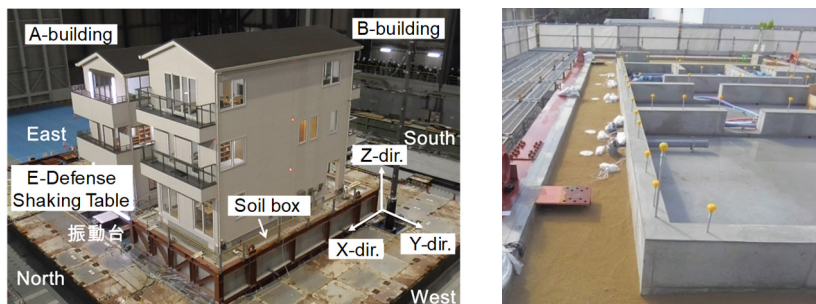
Setup of the test building (B-building), and the foundation constructed on 1.5 m-high soil
